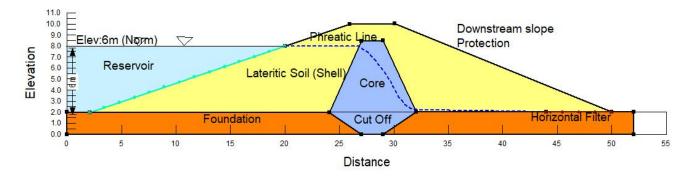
Typical Cross-section of Saura-Keffi Earth Dam, Nasarawa State
